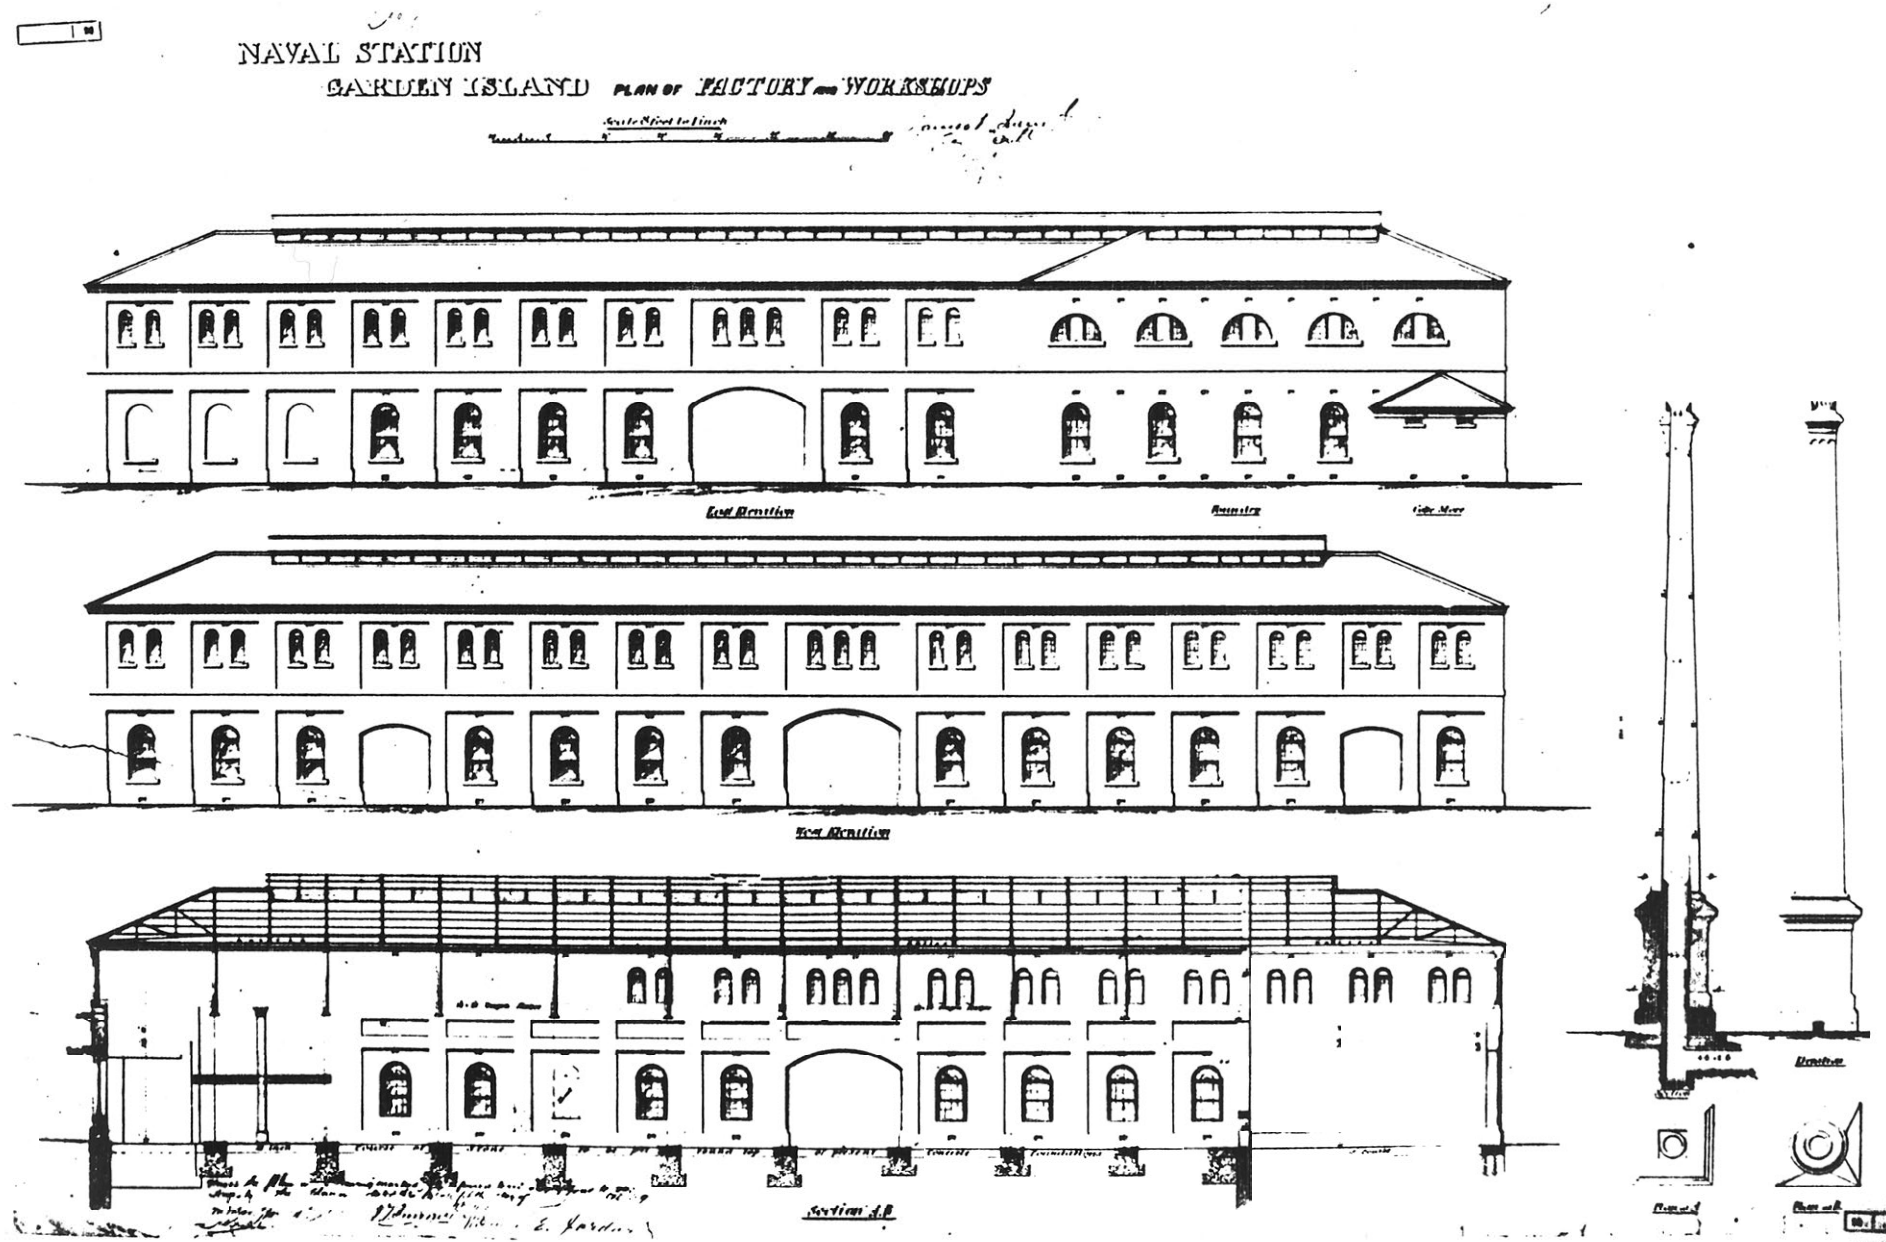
Factory and Workshops - Elevations & Sections, 1889
